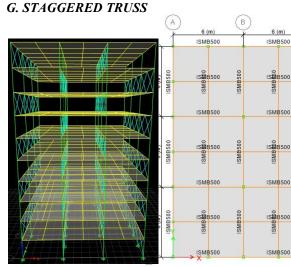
(a) : 3D View of Staggered Truss System Fig. 7 : Staggered Truss System
